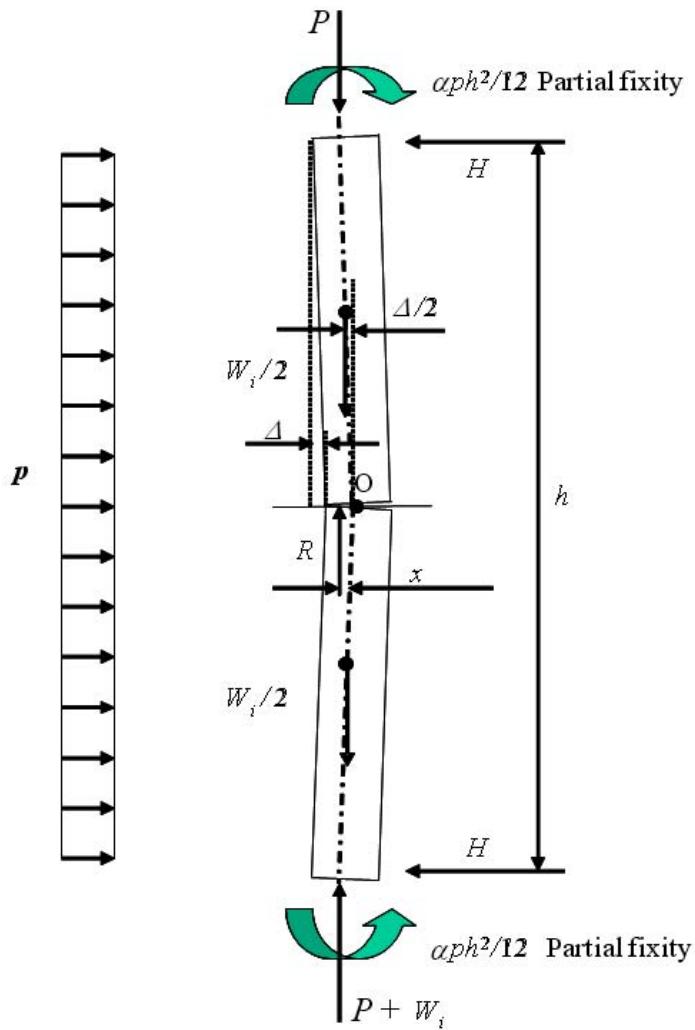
Unreinforced masonry wall spanning vertically and subjected to lateral load
